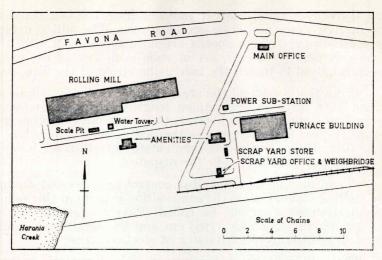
Site Layout of Pacific Steel's Mill.
